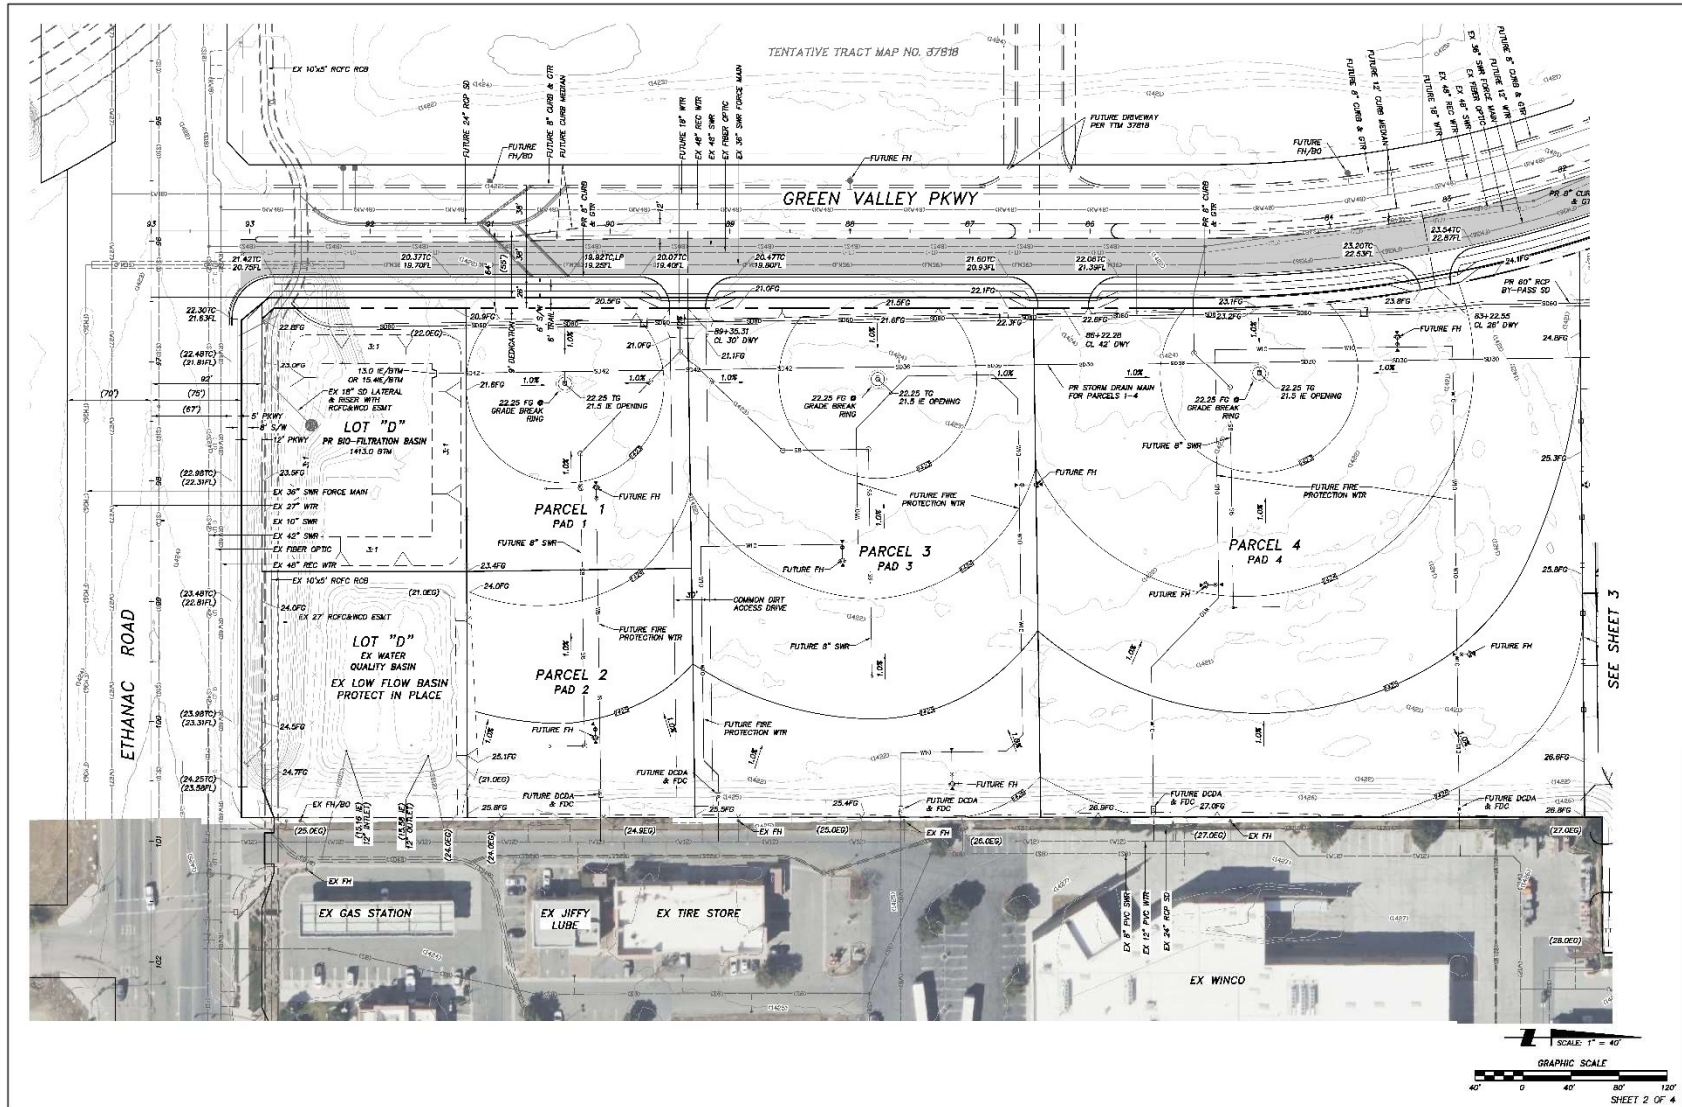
CIVIL PLANS (3 OF 3)
